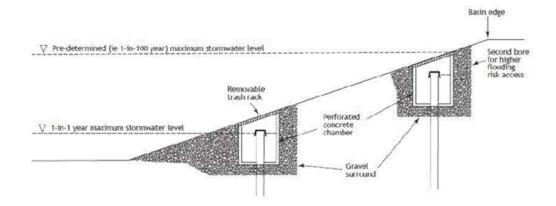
Retention Basin Typical Section (EPA, 2007)
